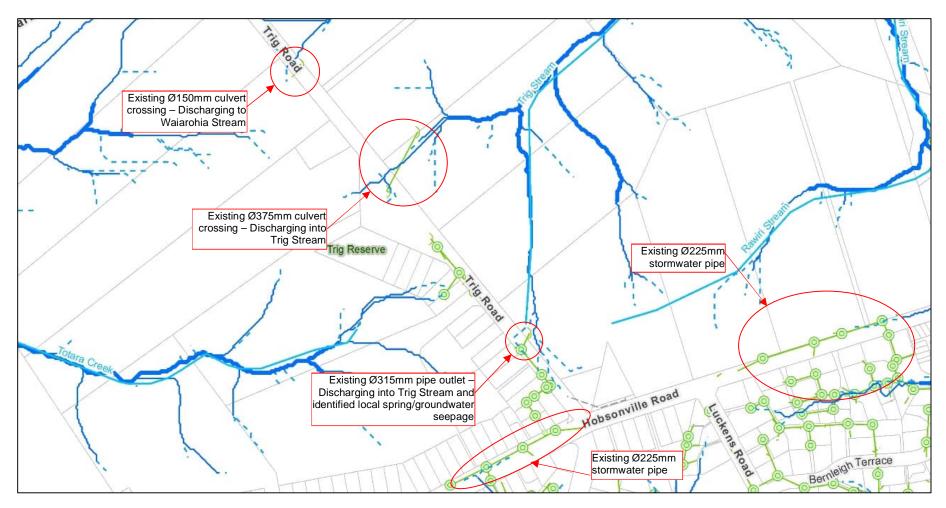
Existing Trig Road Corridor/Hobsonville Road Stormwater Infrastructure (AC – Geomaps 2022)
